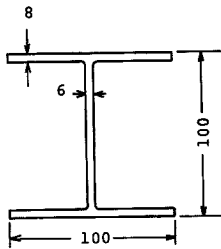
Cross section of wide-flange H-section steel bar (unit=mm)
